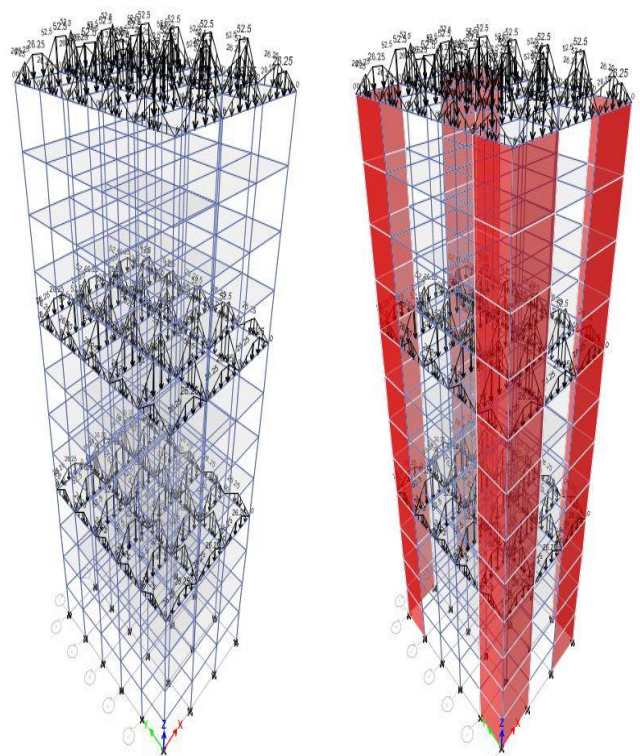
3d View Of Building With Heavy mass at 4th, 8th & 12th floor With And Without Shear Wall
